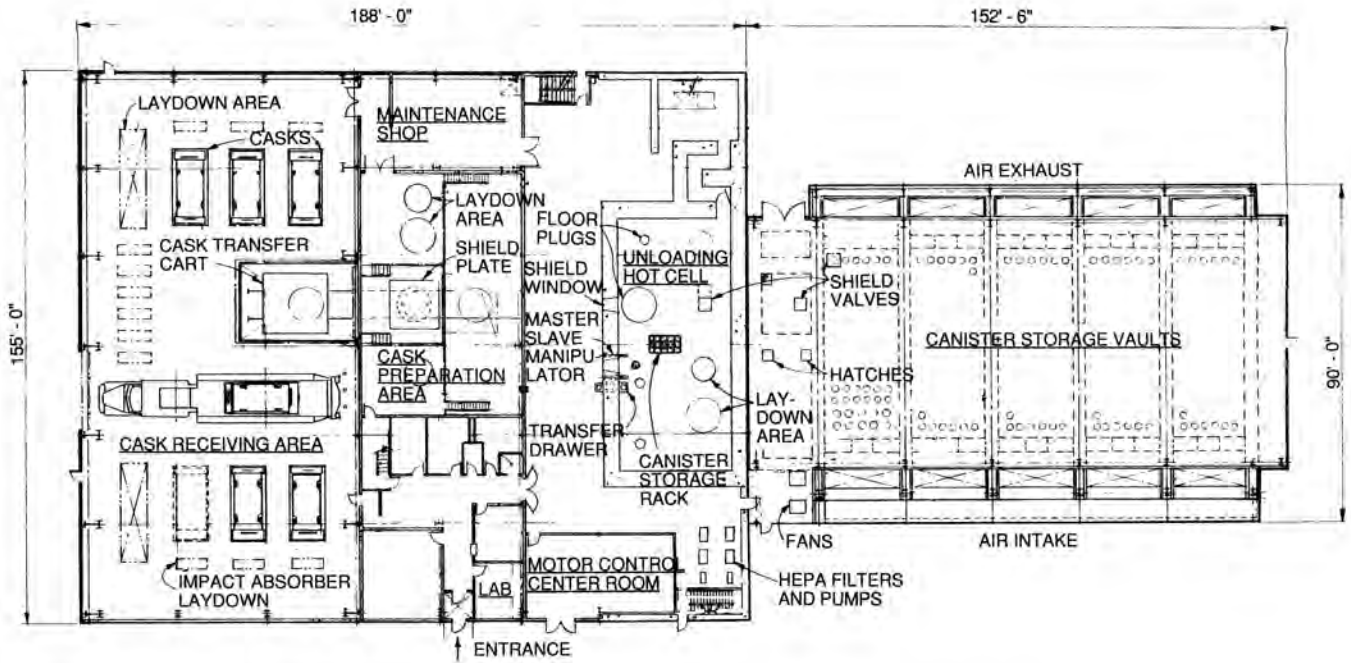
Plan View of the Vitrified HLW Storage Facility.
